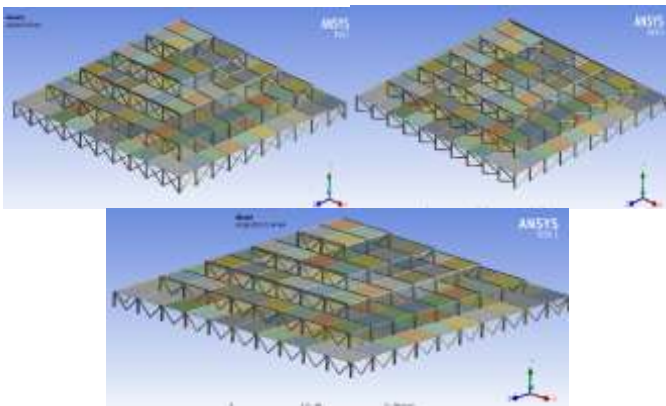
3D Model of Pyramidal buildings with X, K and V bracings
